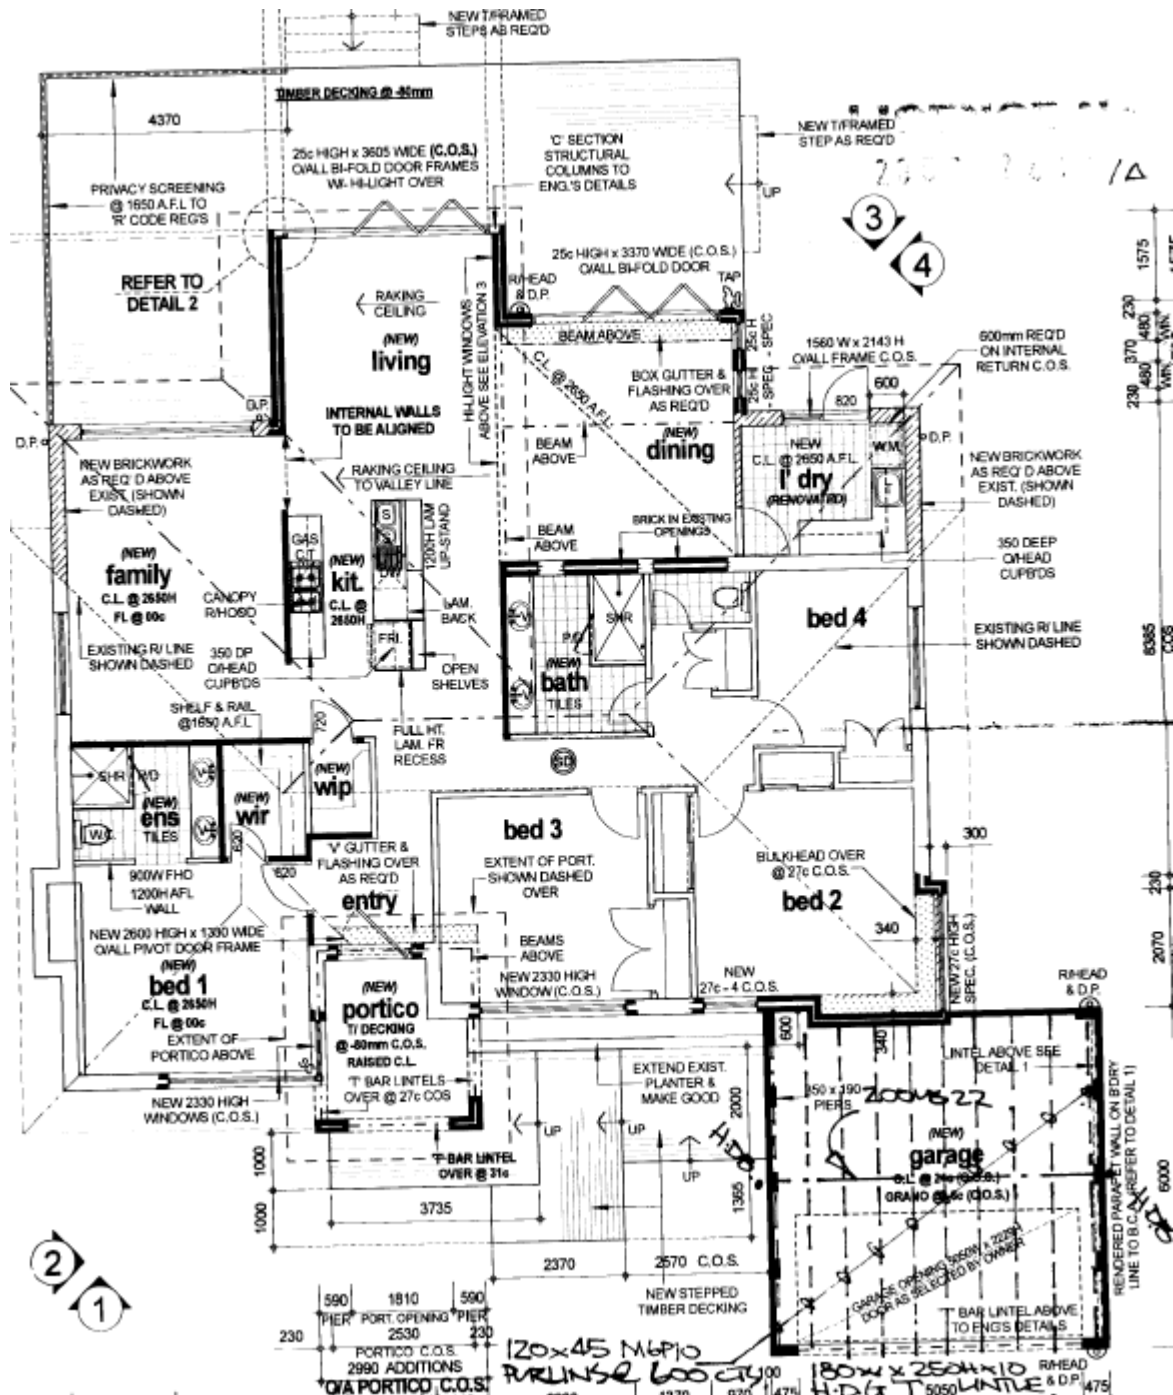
Adjacent southern property floor plan showing major openings to living, bed 2 and bed 4 rooms.
